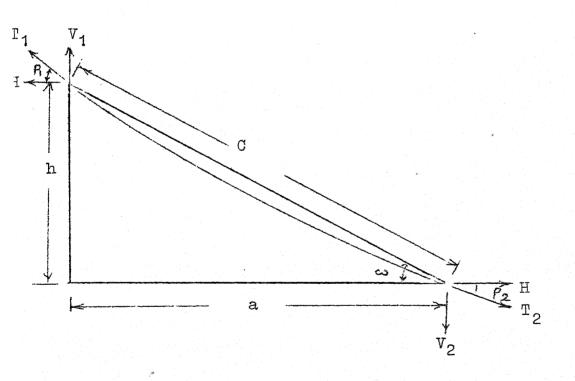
ELEVATION OF A GUY IN NORMAL POSITION
